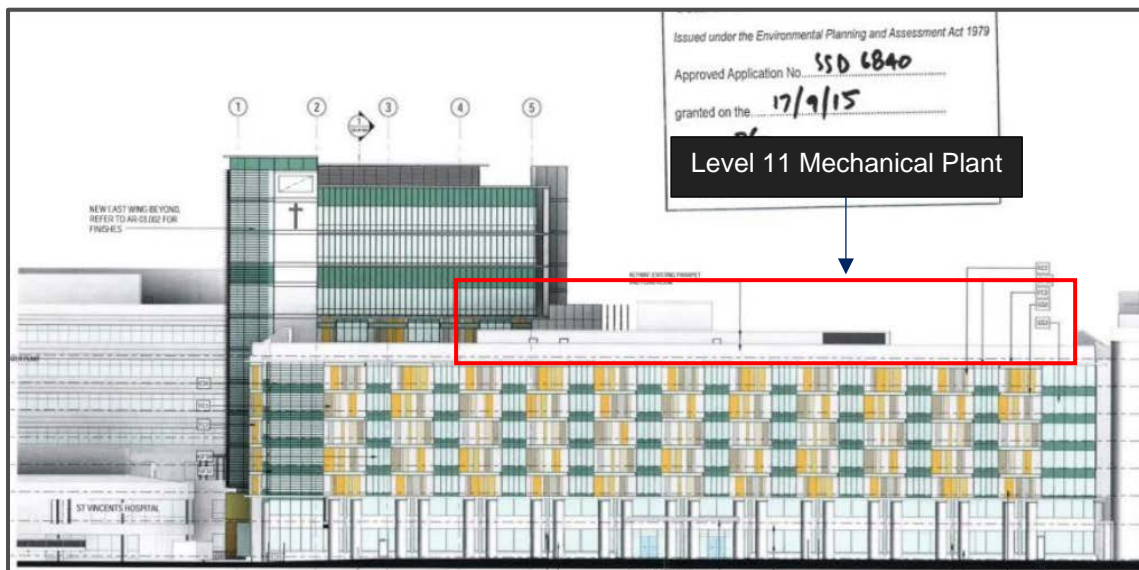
| Approved Northern Elevation (Source: Modification Report)
